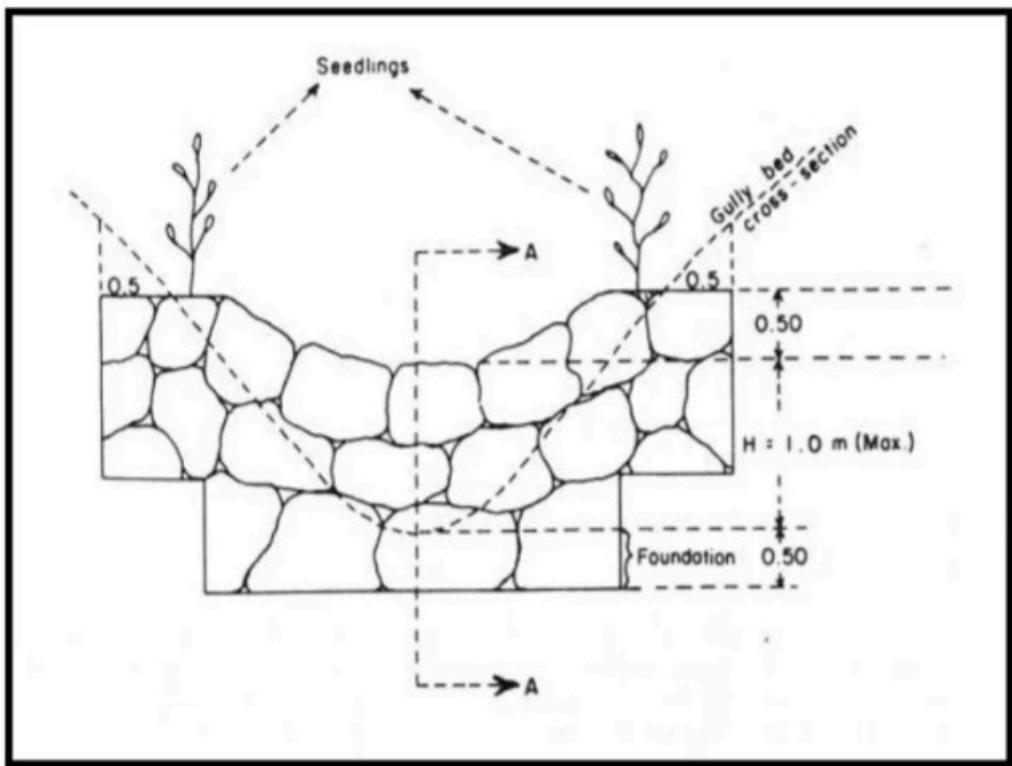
Typical Cross-Section of Loose Boulder Check Dam
